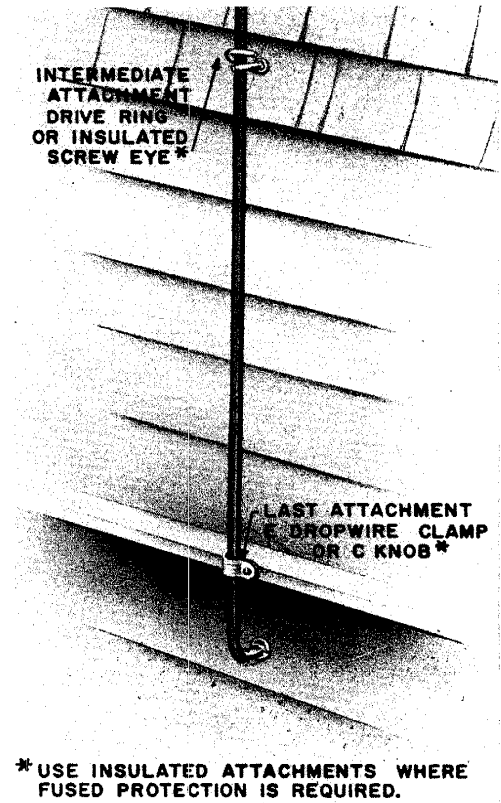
Crossing Wood or Stucco on Wood Building Projection
